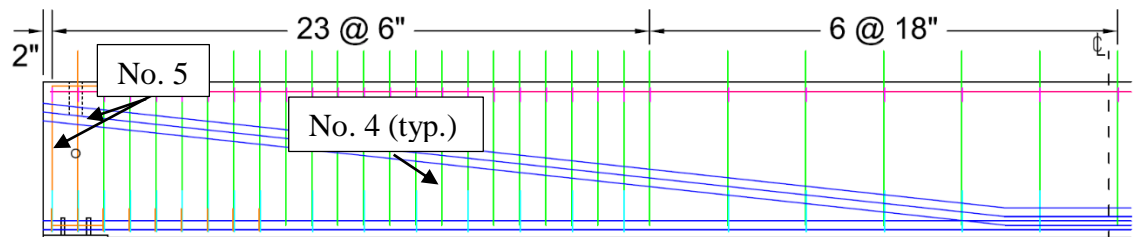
Transverse reinforcement layout for the 36M_18F girder end.
